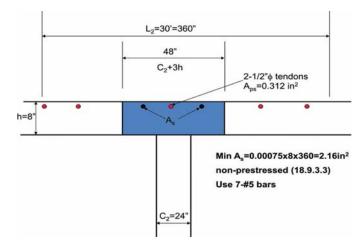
Two-way slab with unbonded tendons (ACI 318-11).
